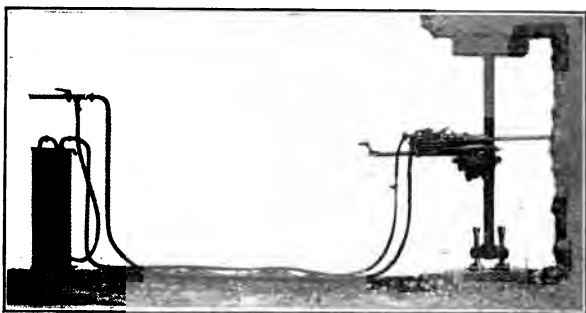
Mounted Hammer Drill. Leyner-Ingersoll Type Set Up on Column with Arrangement when Water Tank Is Used.
